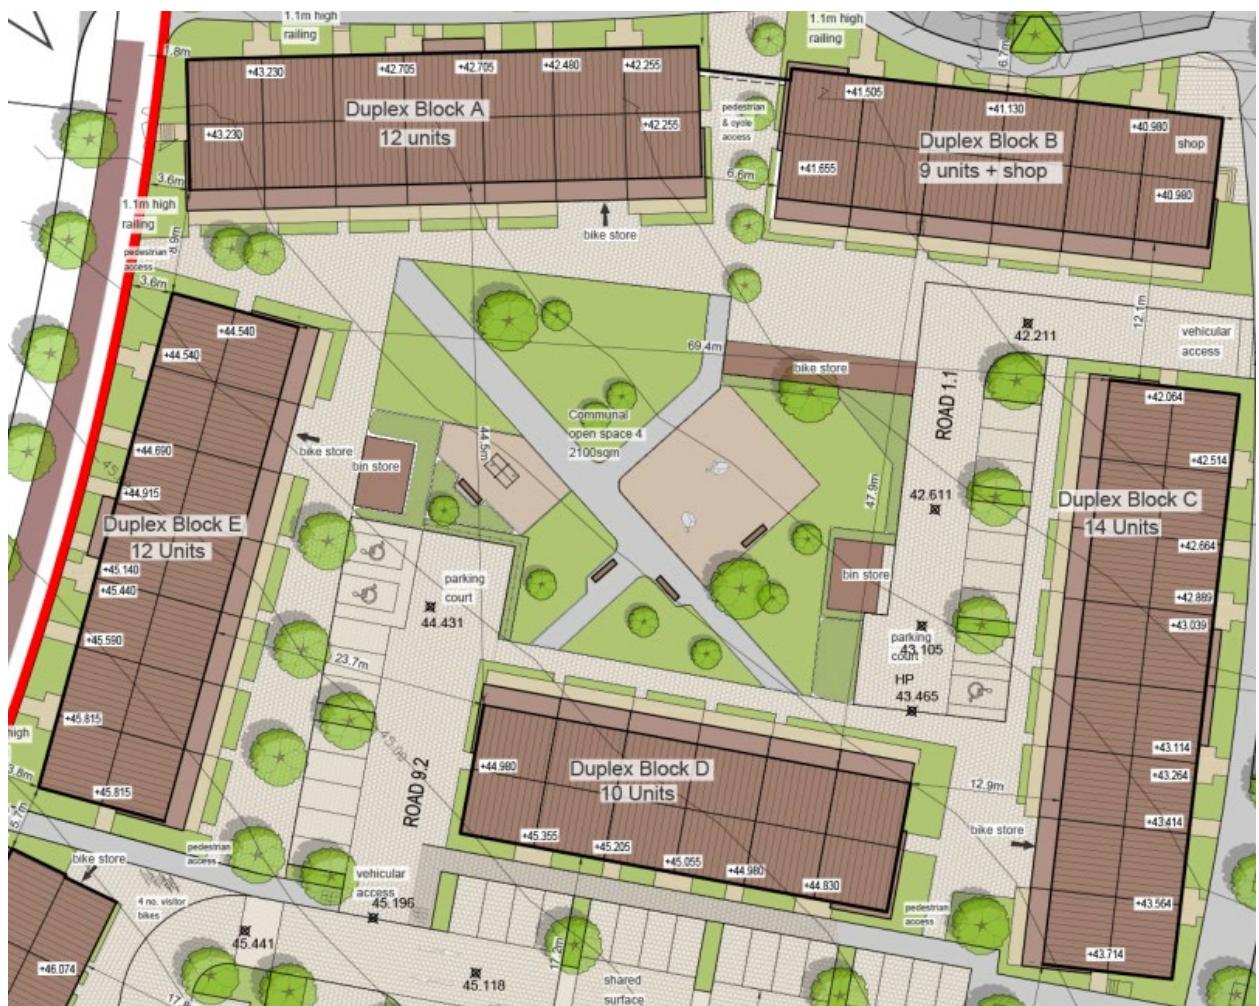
Proposed arrangement of Duplex Blocks A, B, C, D & E
